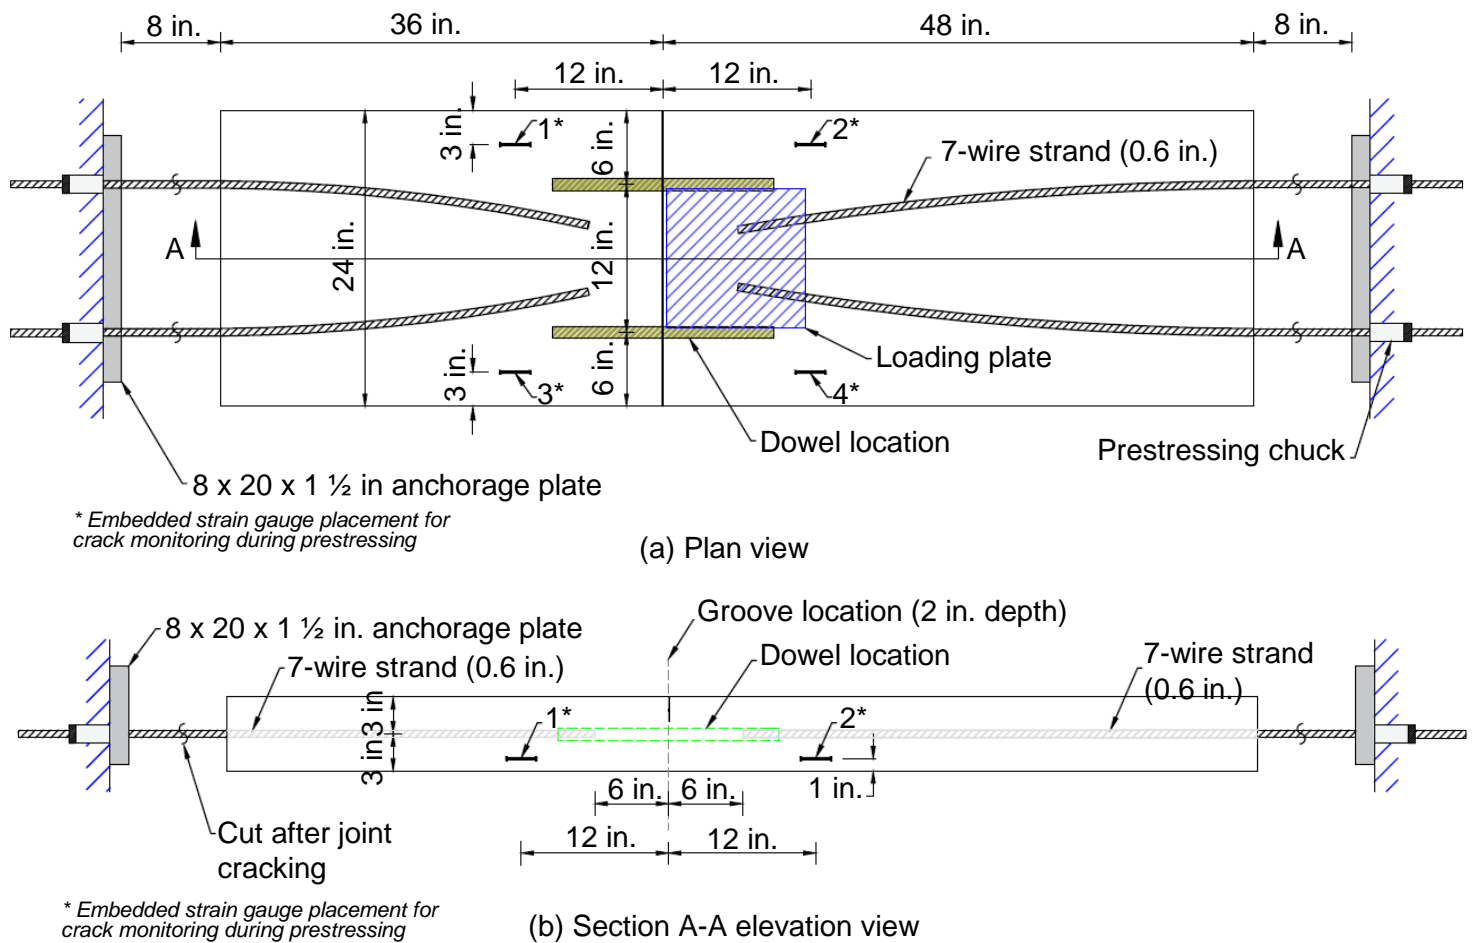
Specimen 4 testing setup showing anchorage system and strain-gauge placement in the plan view (a) and the elevation view (b).
